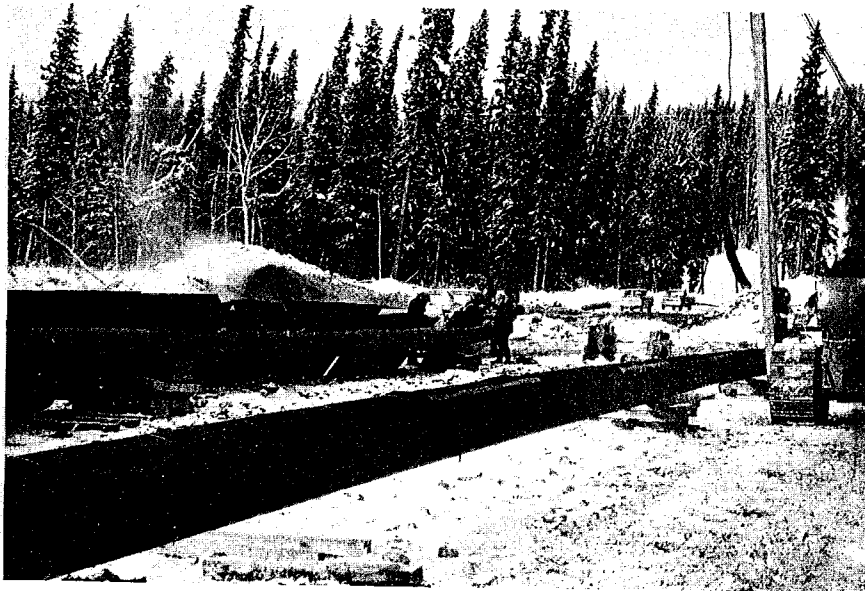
Welded and wrapped section of pipe. Note the additional wrapping for river crossings.
